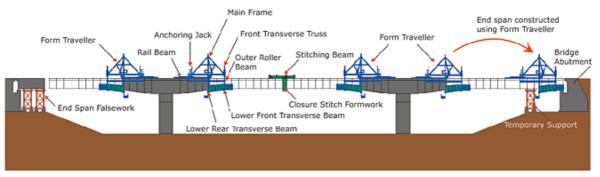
SCHEMA OF FREE CANTILEVER METHOD CONSTRUCTION TECHNOLOGY
